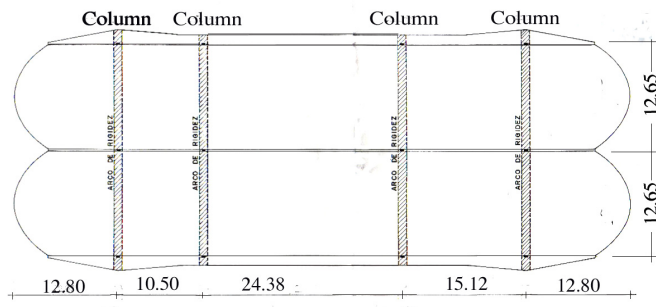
Plan of Fagar Cola, Colonia, Uruguay (Dieste Archive)
